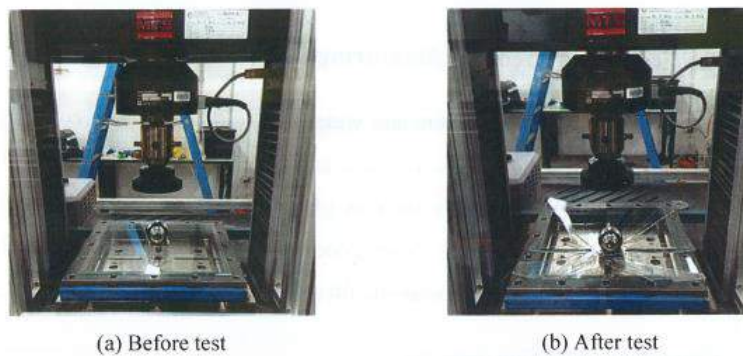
Testing glazing panels to failure on a normal test rig (Sun *et al.*, 2015)
